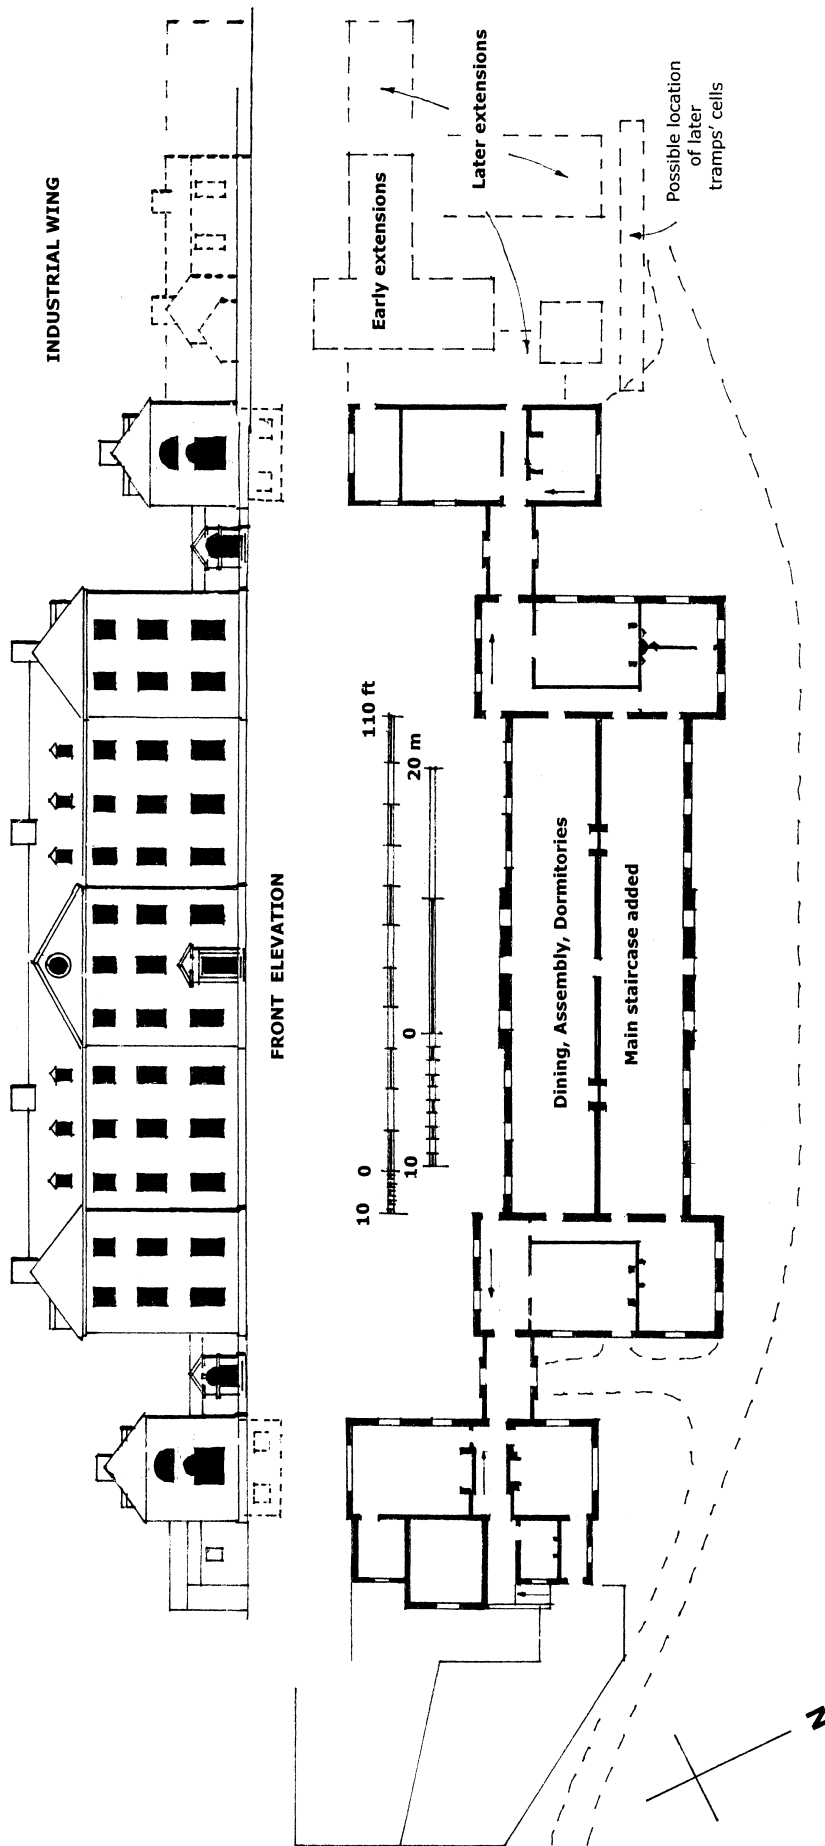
The north face and conjectural plan of the Shrewsbury house of industry. (Mainly after Pritchard's original drawing.)
